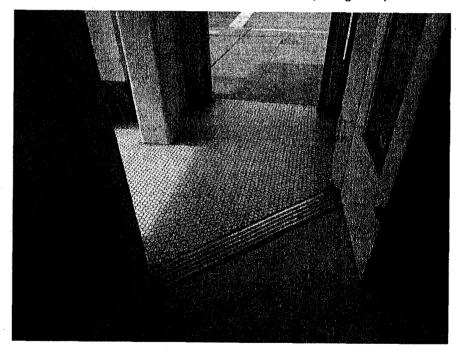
Photo showing the original corner storefront entry, porcelain tiles, doors.
